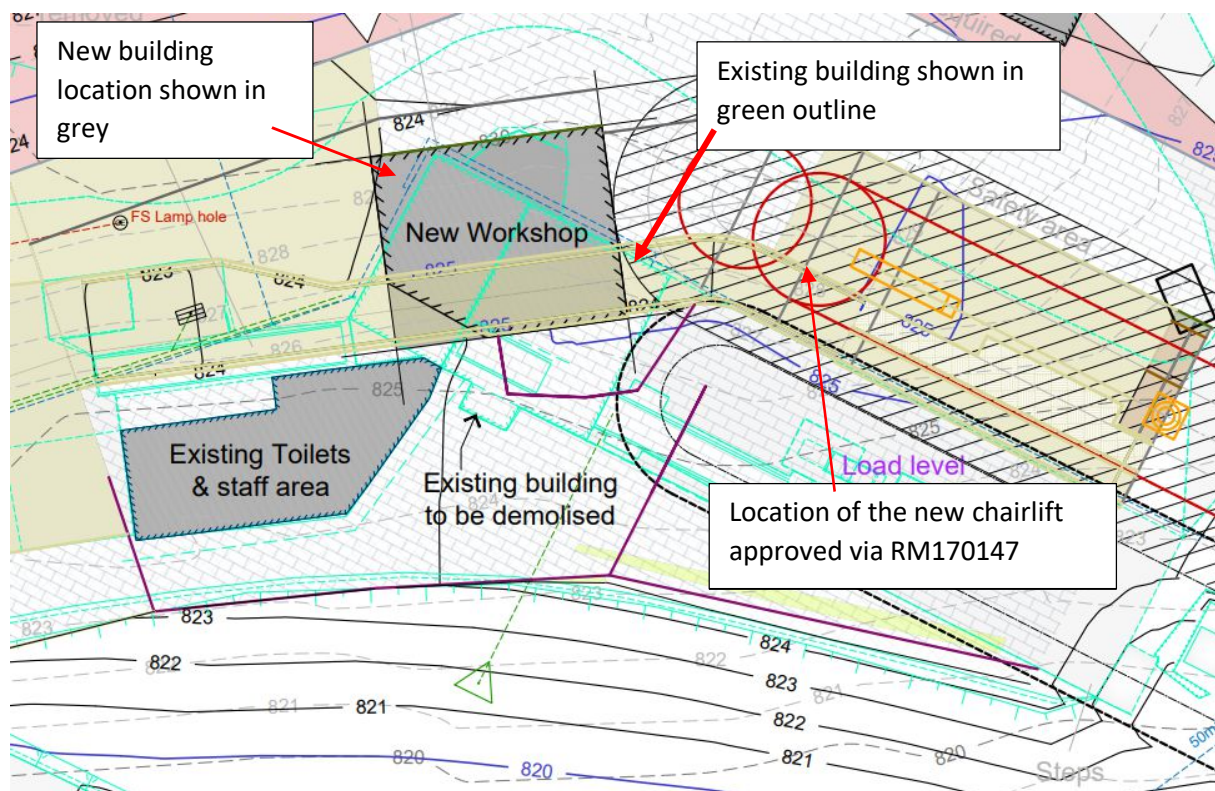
Proposed location of the new workshop building in comparison with the existing terminal/workshop building.
